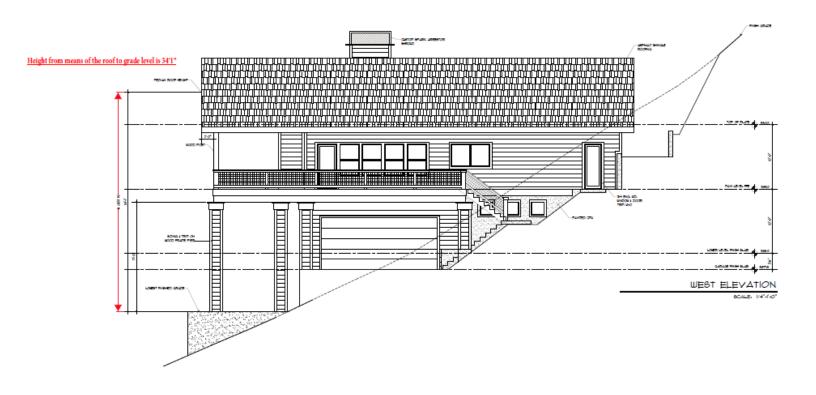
Revised West Elevation (reflects Planning and Zoning Commission recommendation)
